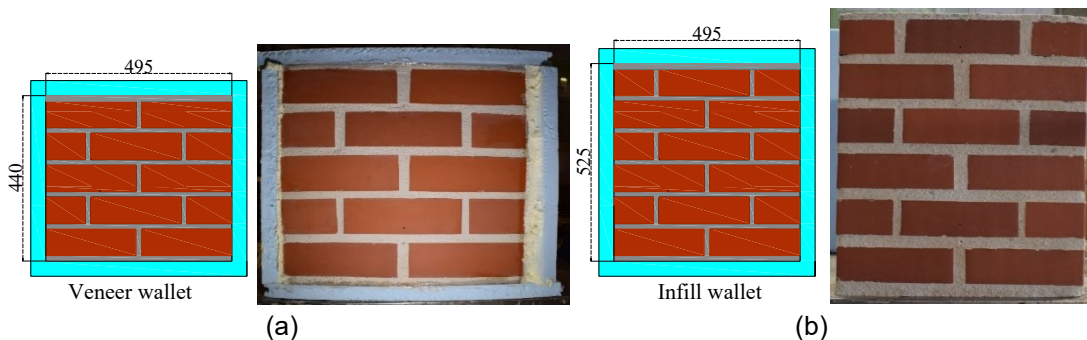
Tested masonry wallets using (a) veneer and (b) infill mortar (dimensions in mm)
